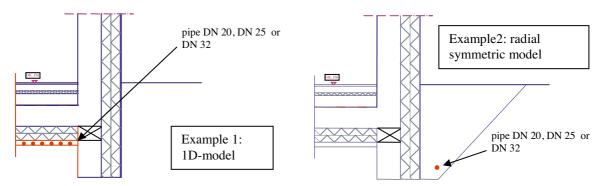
Horizontal ground heat exchanger in blinding layer with 360 m piping in 4 parallel loops (1D model, left) and ground heat exchanger in surrounding excavation with a length of 52 m (right)
